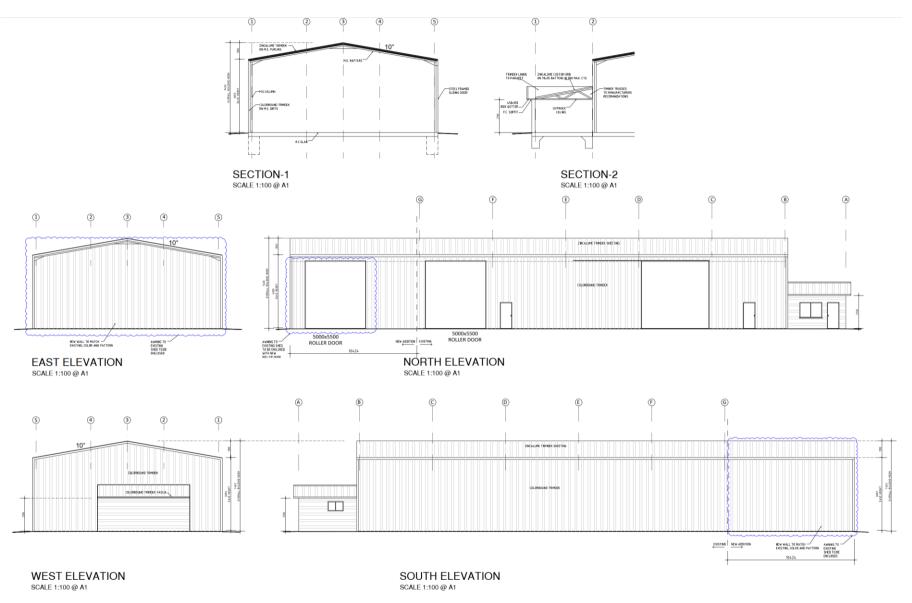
Proposed Site Elevation Plan with Amendments to Building
